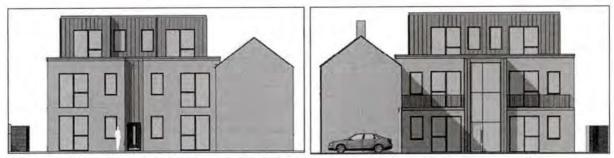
Front elevation: Smaller Residential Building Figure 6 - Rear elevation: Smaller Residential Building
